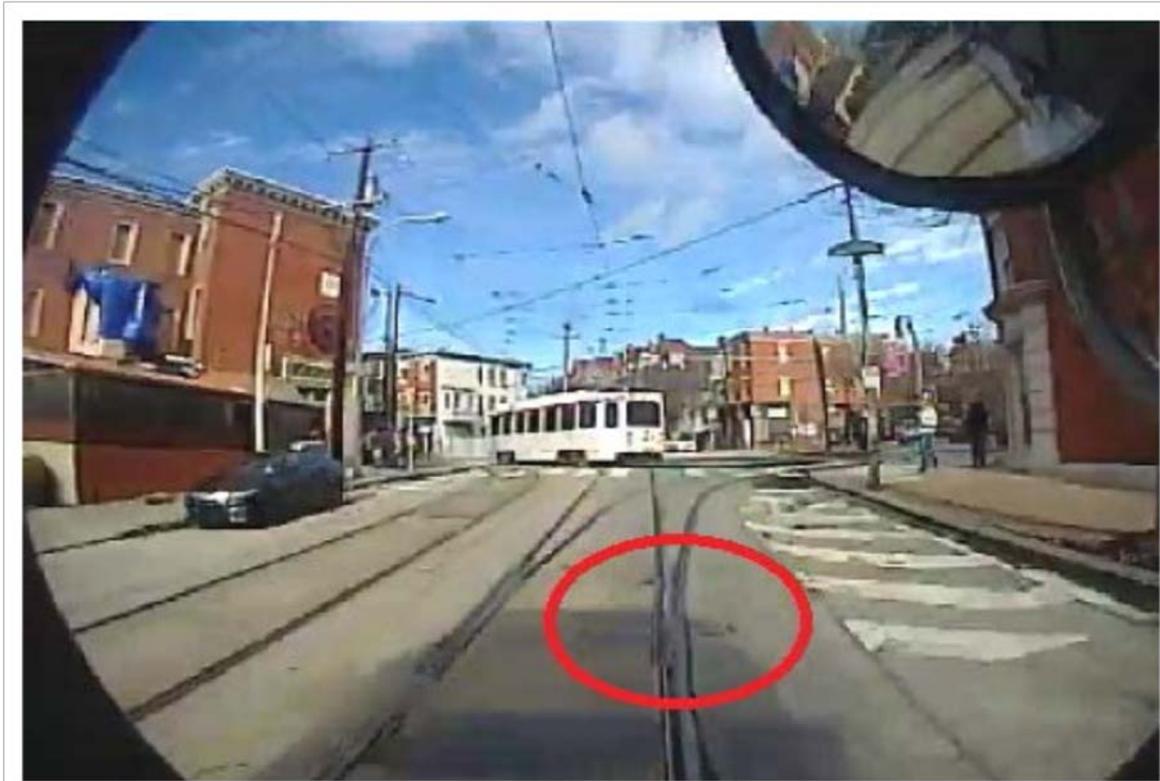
Forward-facing image of the facing point switch at 36th Street and Lancaster Avenue.
